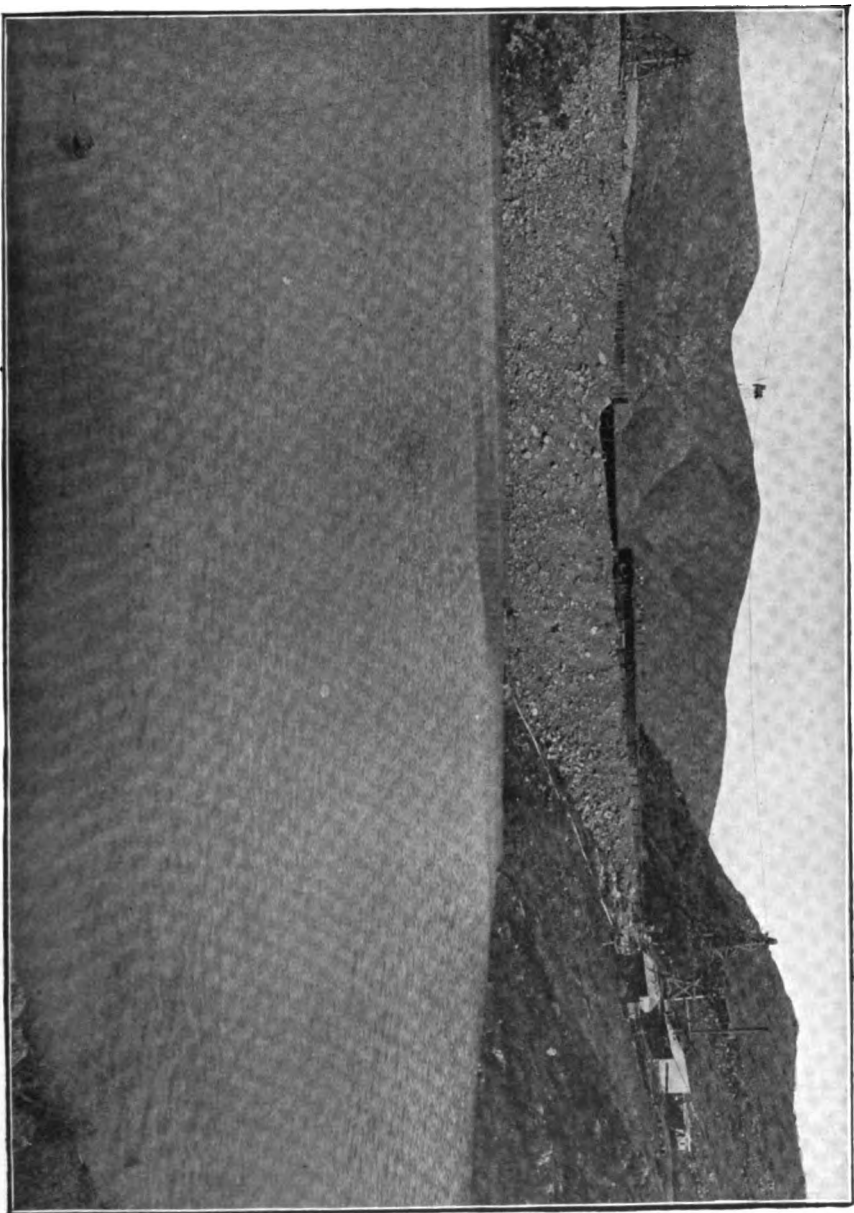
OTAY (CAL.) ROCK-FILL DAM—STEEL CORE.
